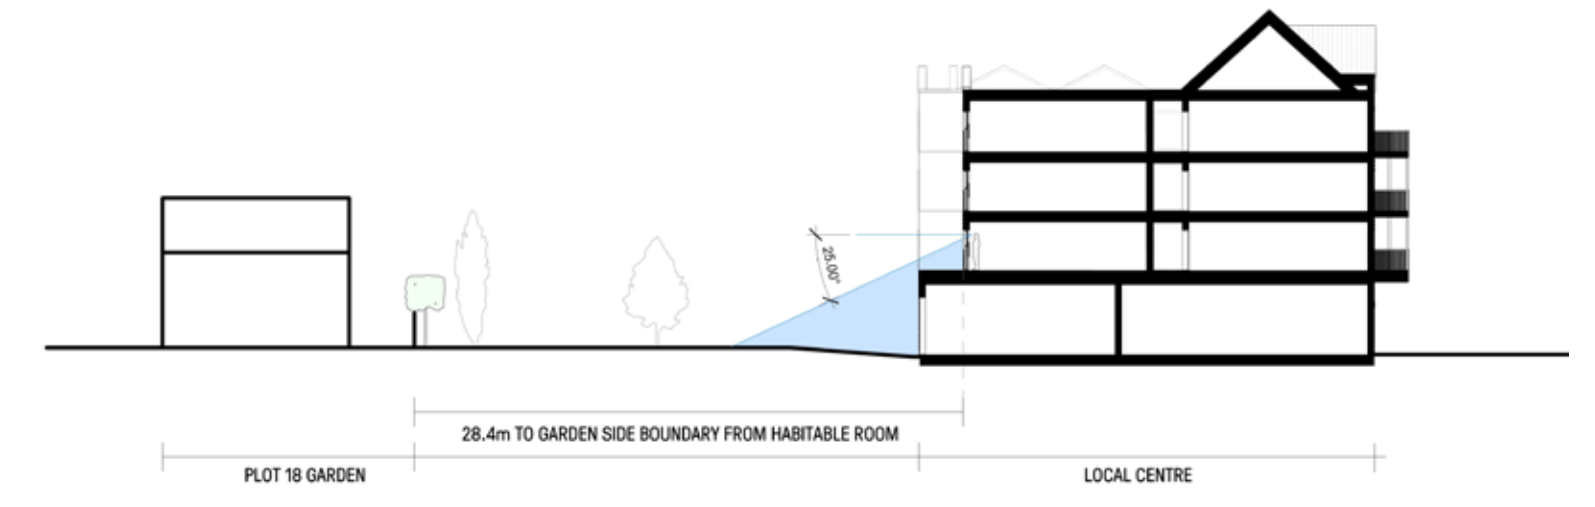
Local Centre & Plot 18 First Floor Privacy Section post Design Workshop/Update
